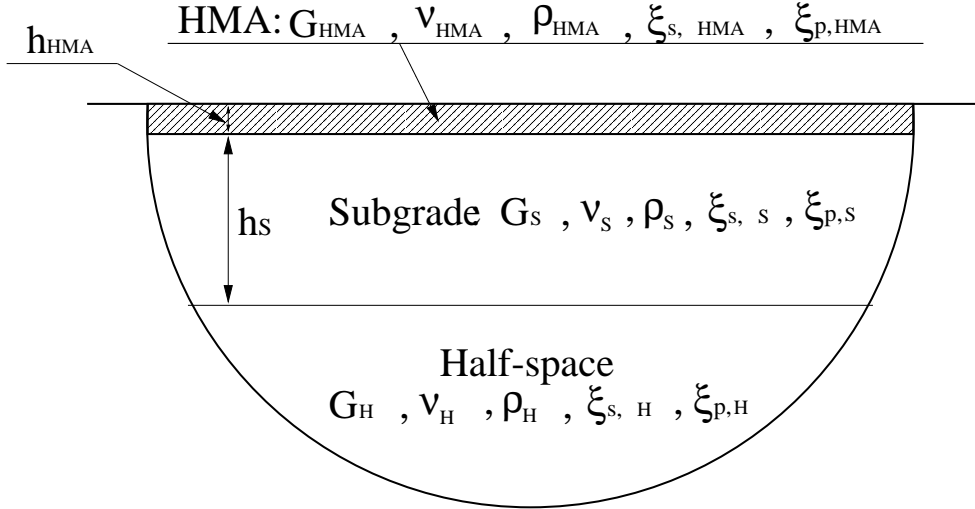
Pavement Profile, Test Section 33t (Transition Section)
